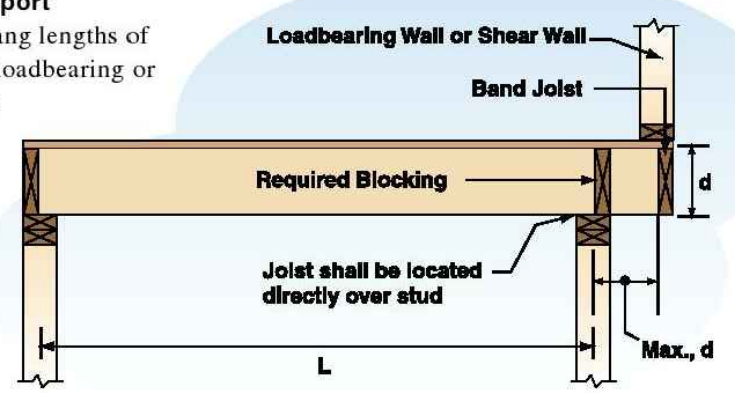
Cantilever with Loadbearing Wall or Shear Wall
